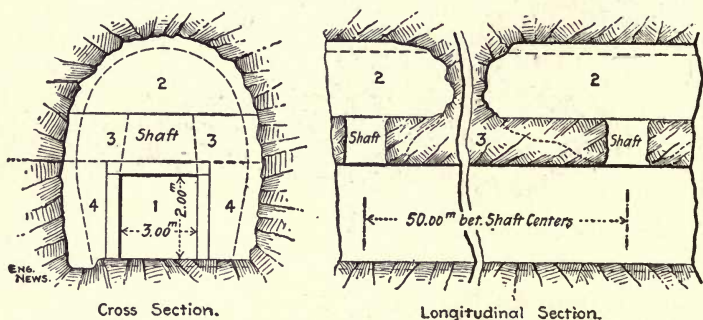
Simplon Tunnel: Sequence of Excavation.
